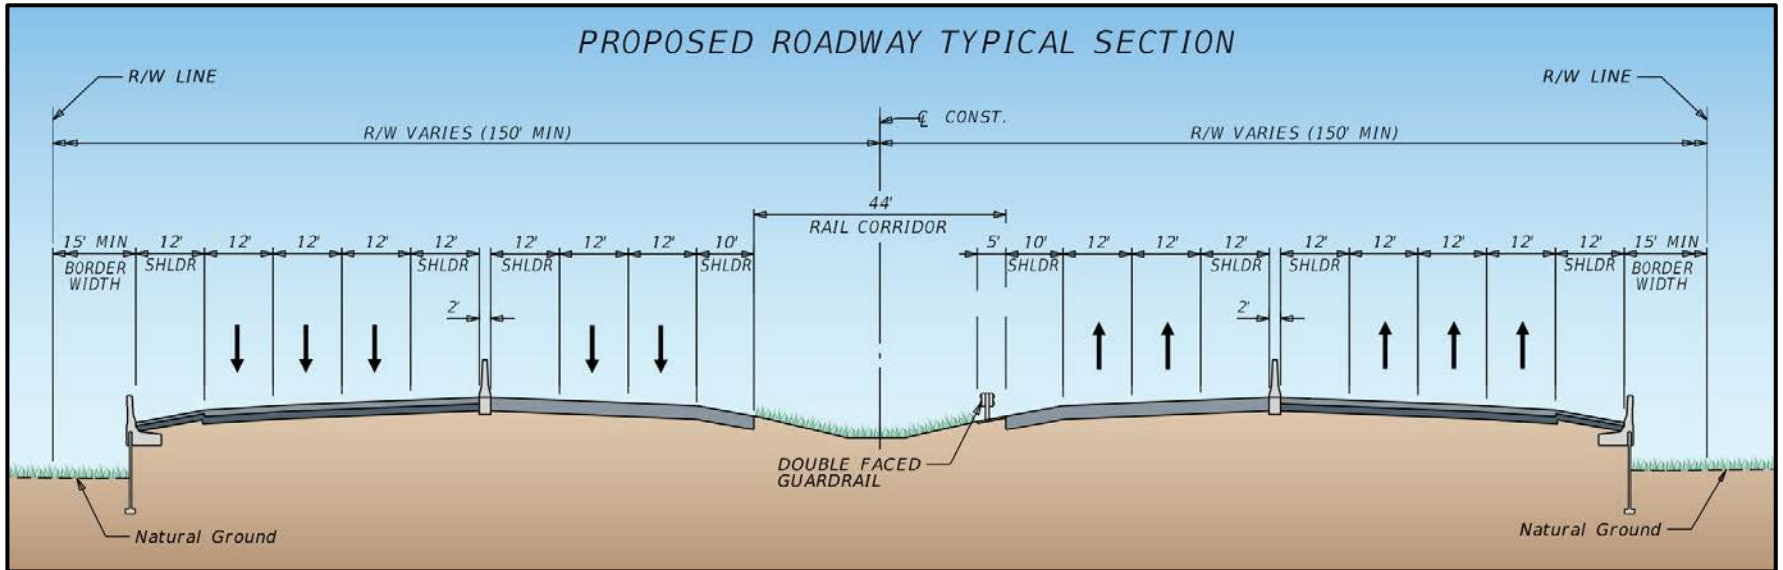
Segment 5 Proposed Typical Section (6+4 with rail envelope)
